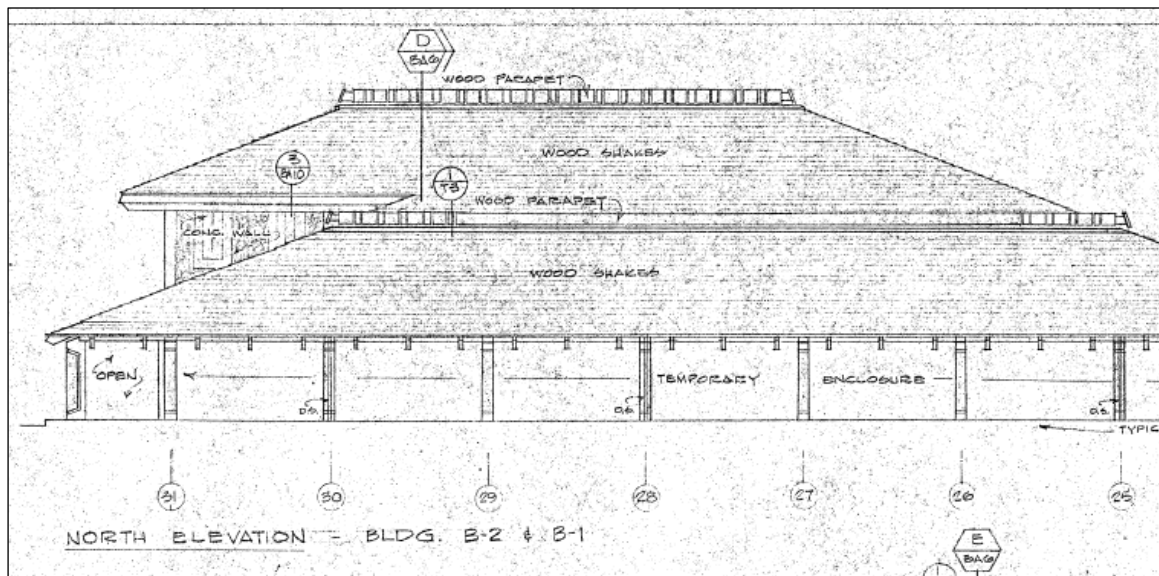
Olof Dahlstrand, looking south at north side of Building B-2 (detail), 12 October 1965. *Courtesy Property Owner.
